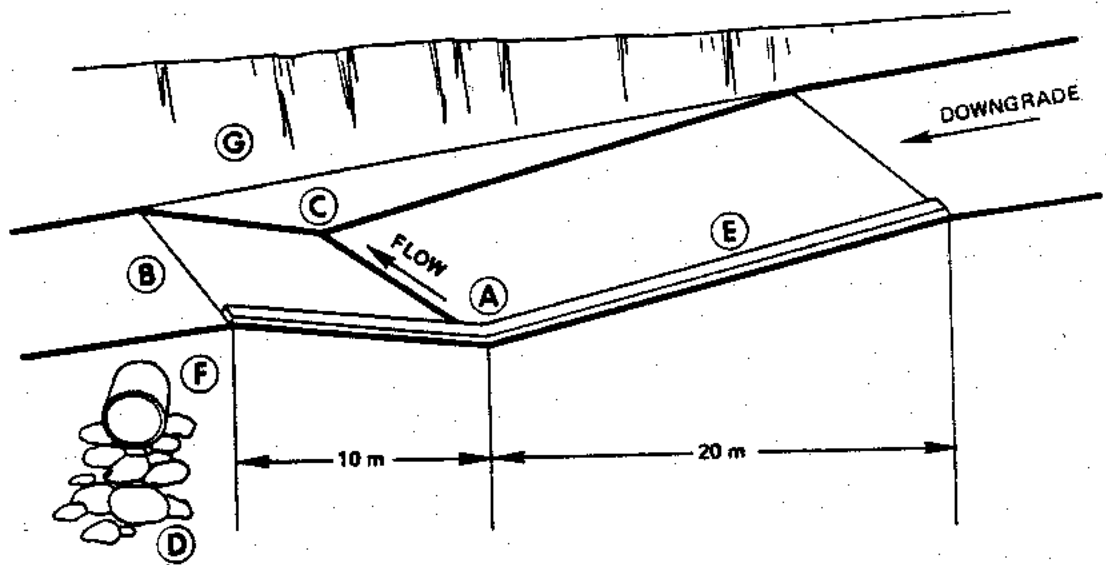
Design of insloped dips for forest roads. A to C, slope about 10 to 15 cm to assure lateral flow; B, no material accumulated at this point - may require surfacing to prevent cutting; D, provide rock rip-rap to prevent erosion; E, berm to prevent overflow; F, culvert to carry water beneath road; G, widen for ditch and pipe inlet (Megahan, 1977).
